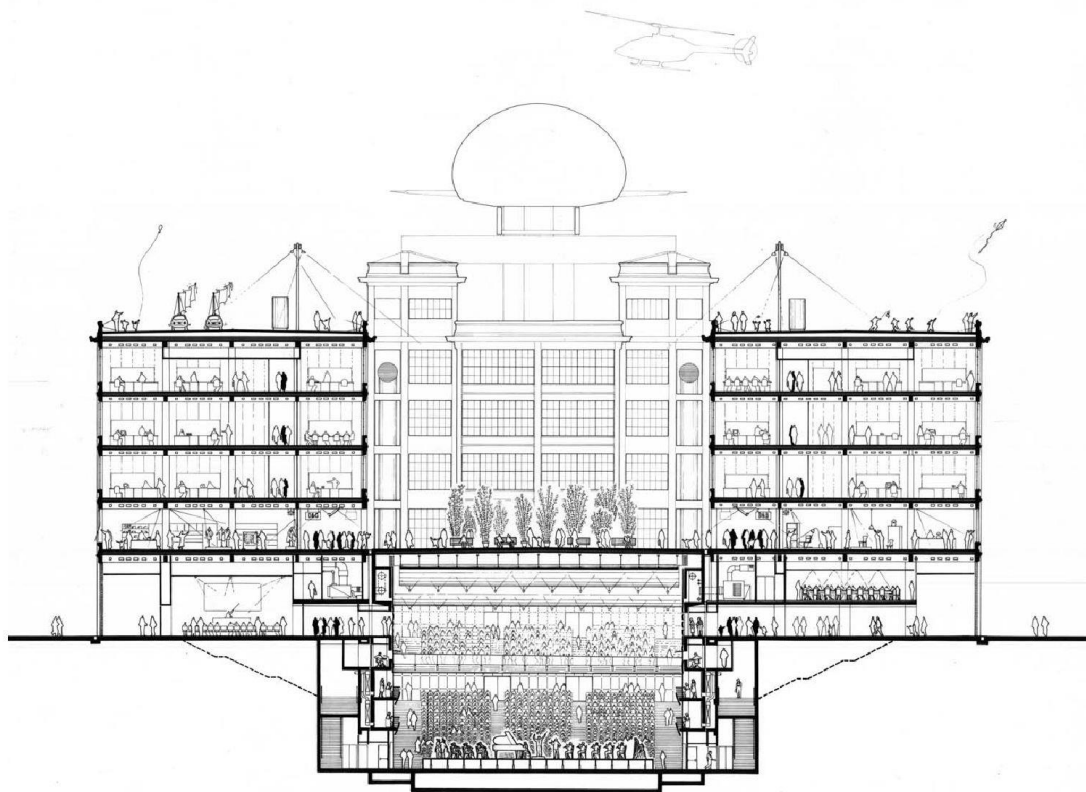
A section through the renovated building design showing the various functions on each level (Renzo Piano Building Workshop, 2003).
